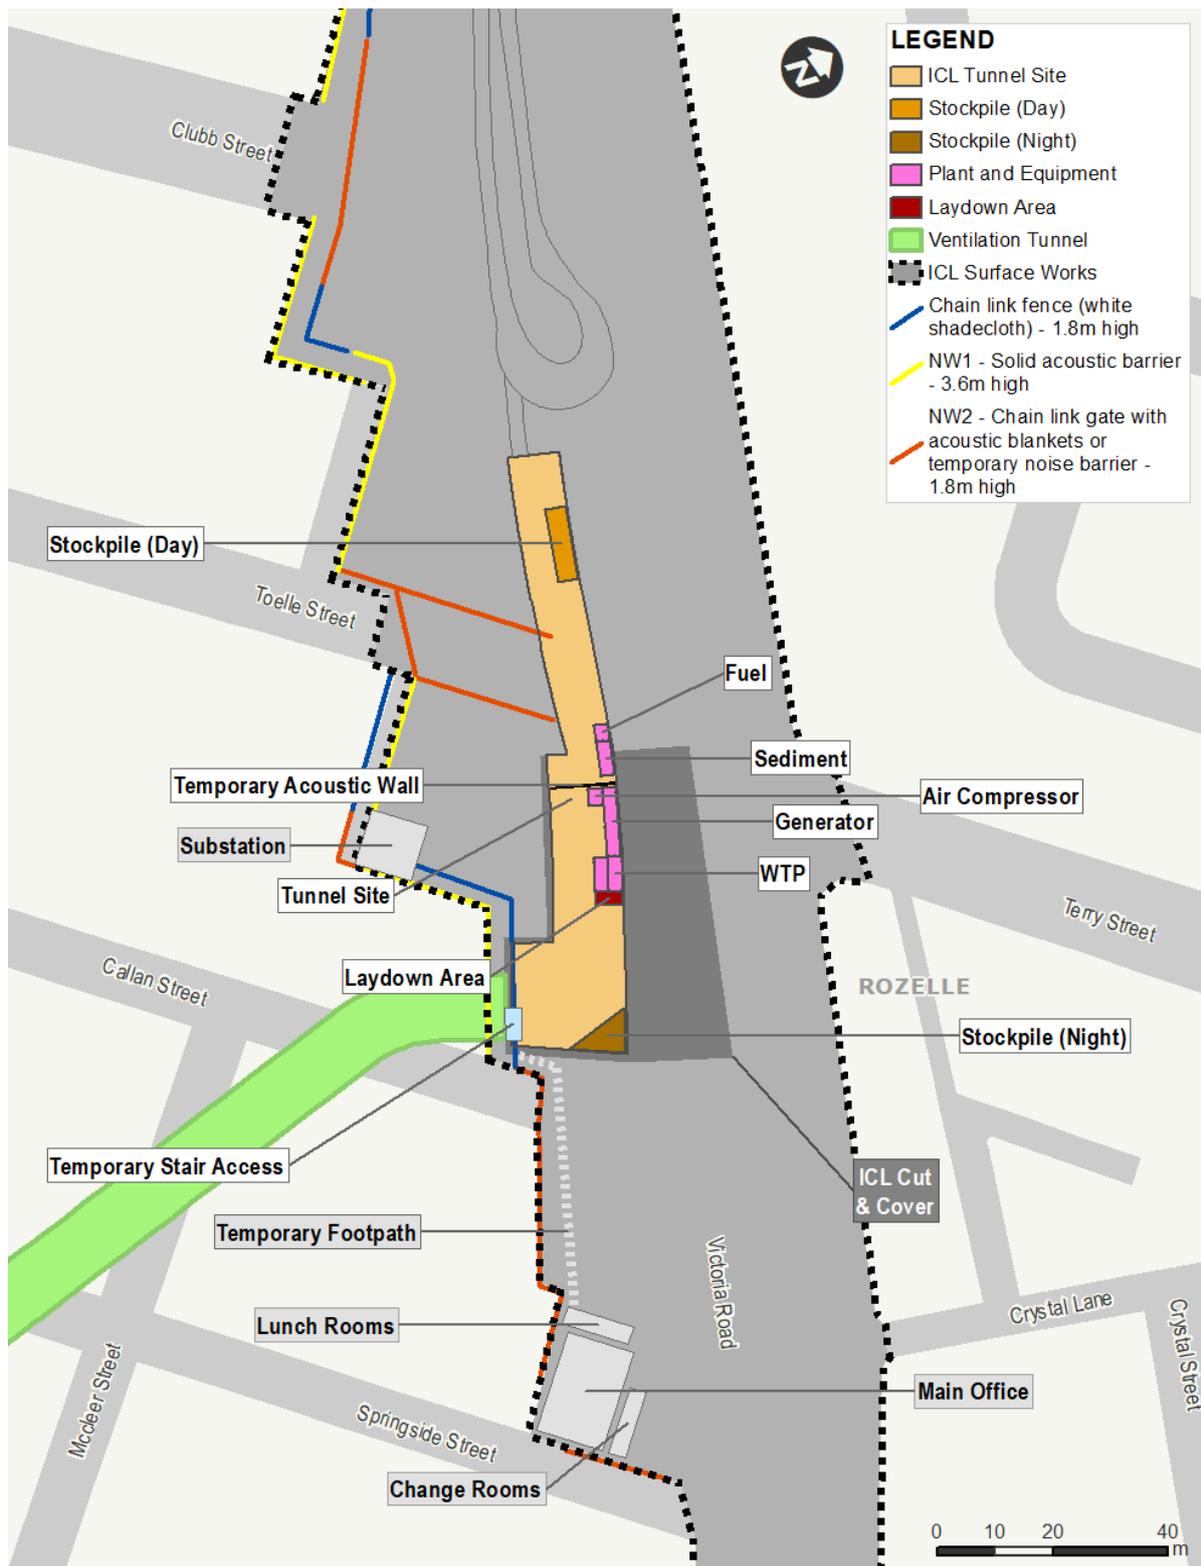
Indicative Layout of tunnel support site within the Iron Cove cut and cover
